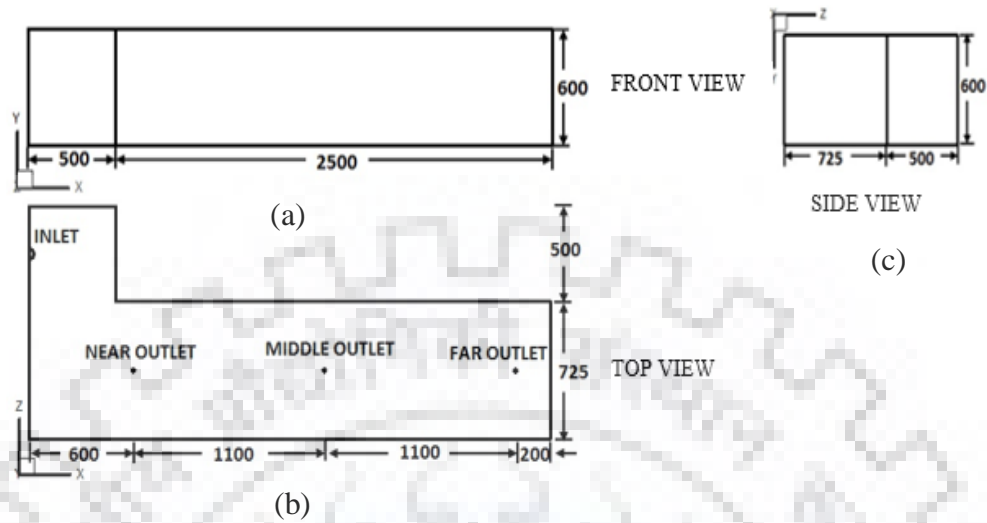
Geometric dimensions of T shape (a) front view (b) top view (c) side view
